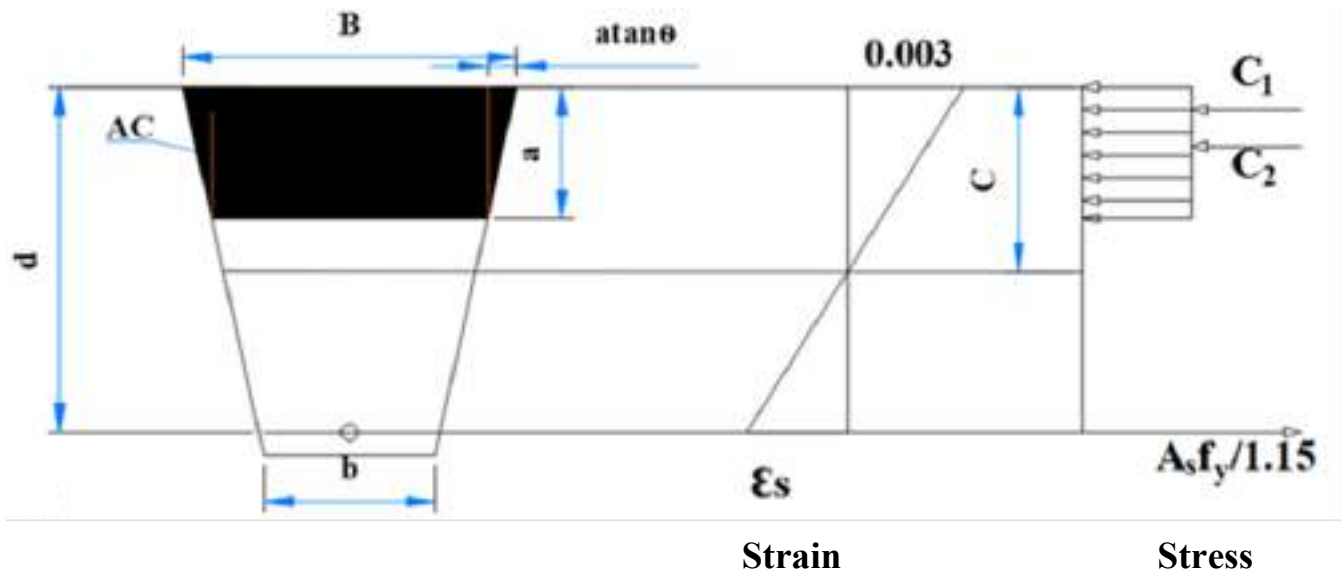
Equivalent rectangular stress block to trapezoidal section [5]
